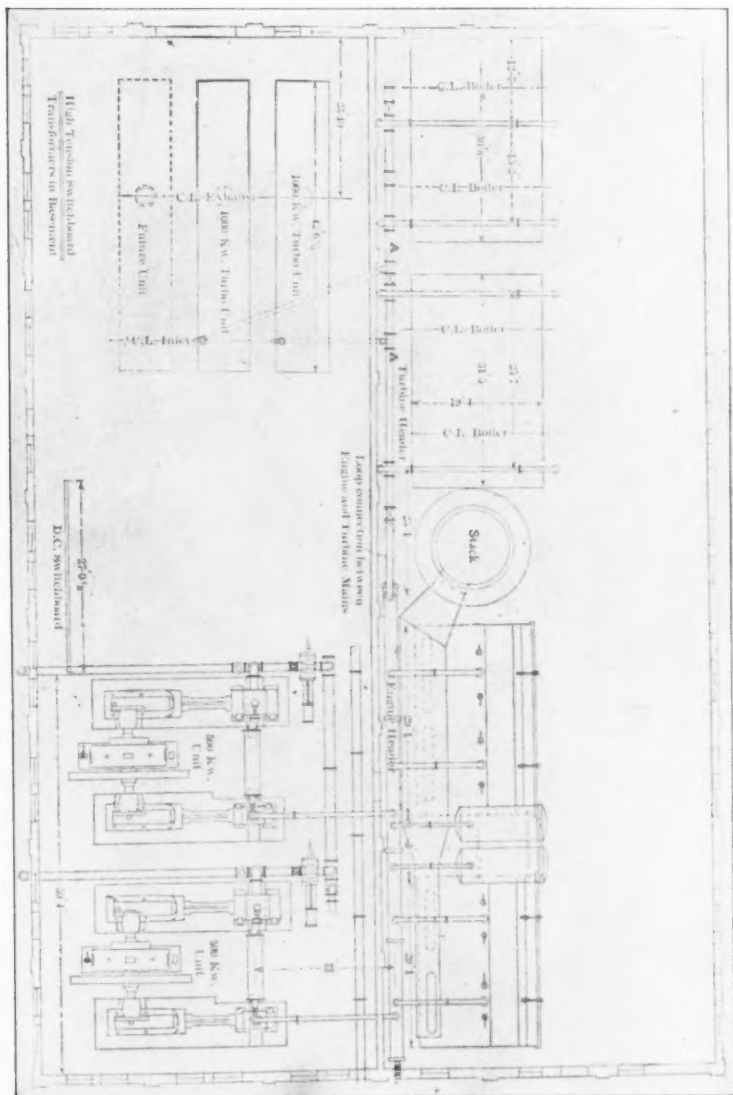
ENGINE ROOM PLAN AT CLEVELAND & SOUTHWESTERN TRACTION Co., ELYRIA, OHIO.
